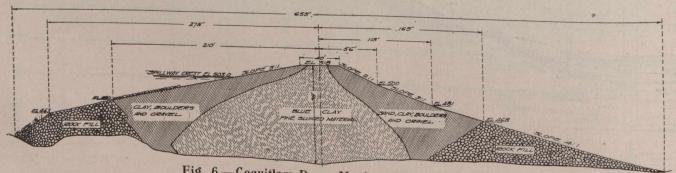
Coquitlam Dam, Maximum Cross-Section as Built.
